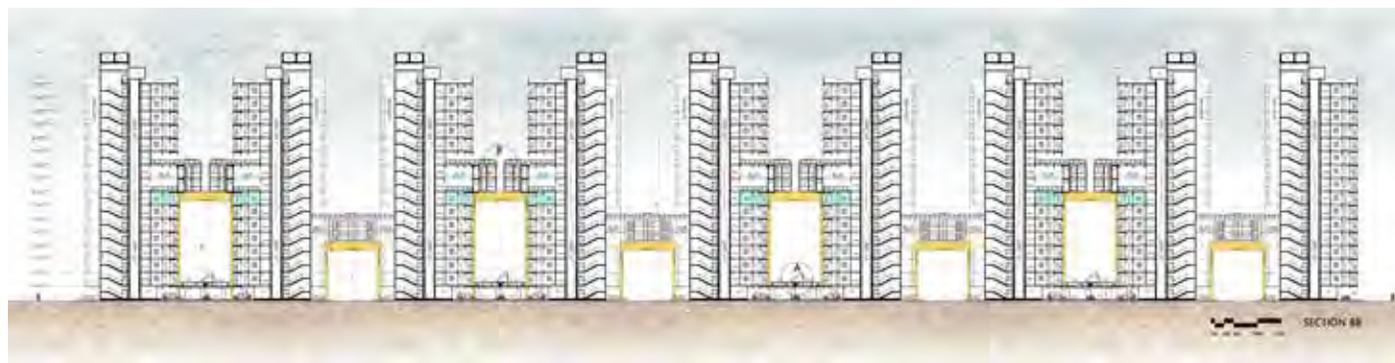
Section through the middle level connecting bridge and highlighting the double height common space
